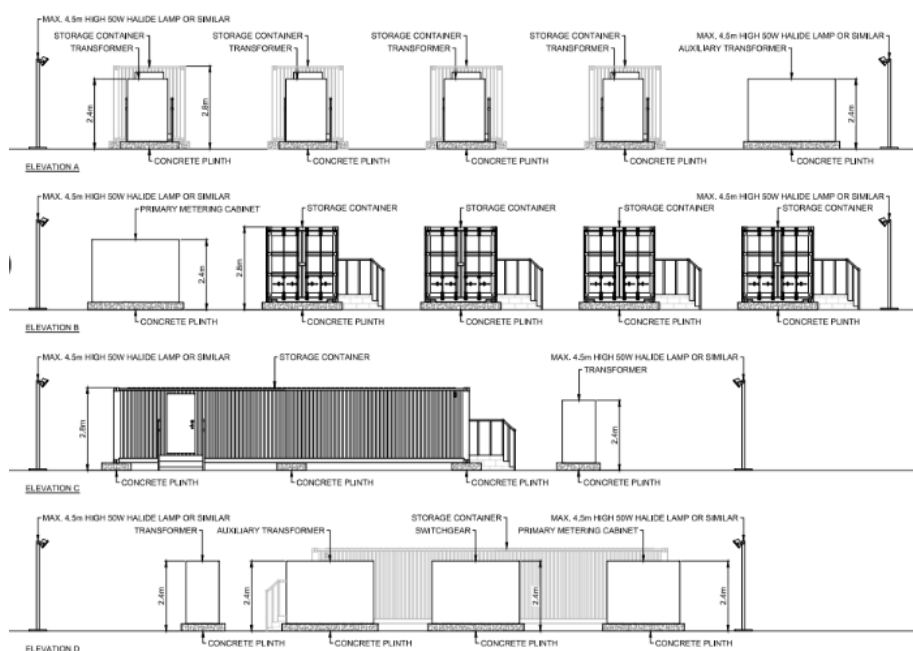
Proposed Elevation and Sections of Battery Energy Storage System
